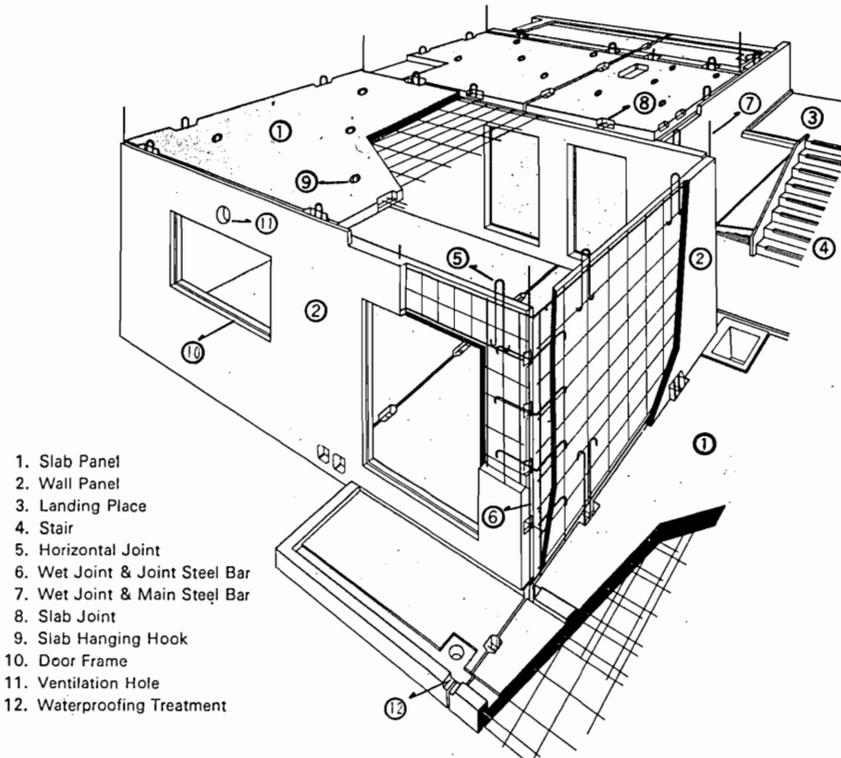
Assembling Drawing of Prefabricated Panels.
